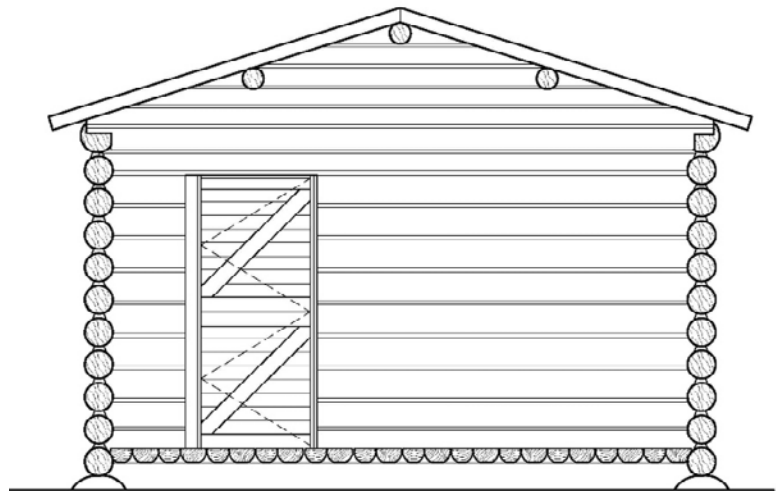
Section-elevation of the Cabin, looking east towards the entry door.
